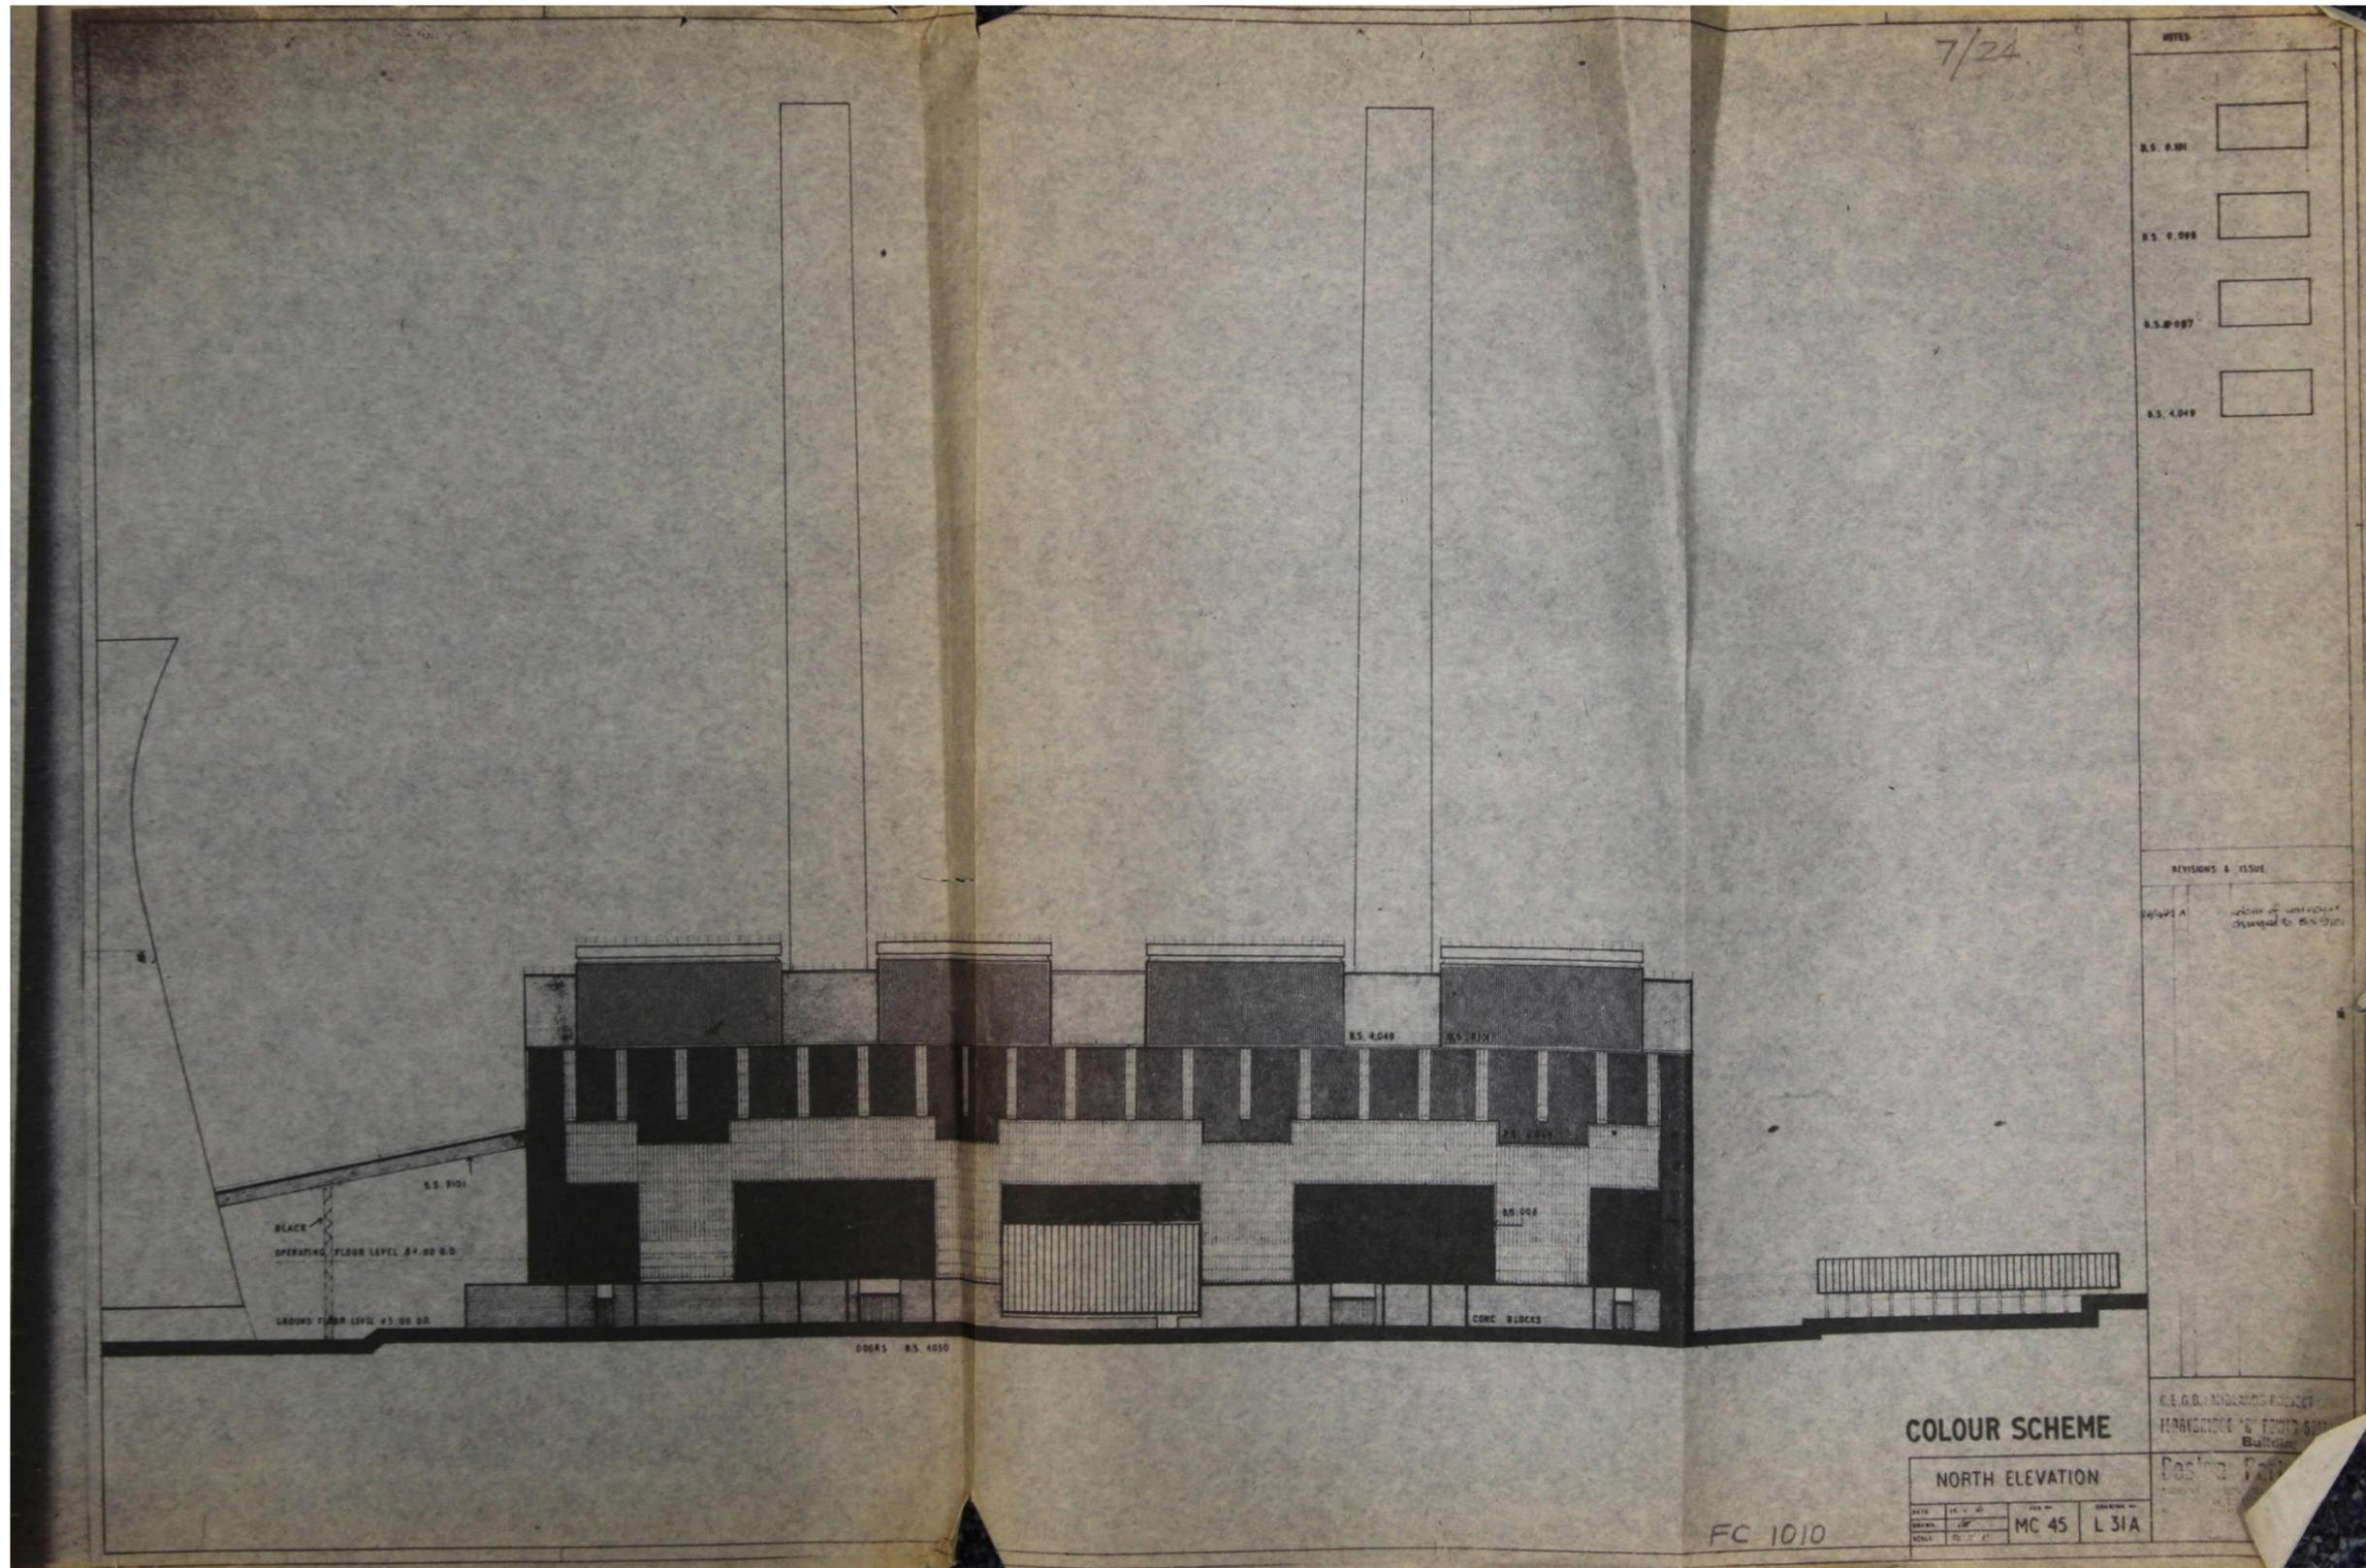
Outline Design Drawing of the north-west elevation of the station, showing the central control block, backed by the turbine hall, backed by the mill bay, backed by the boiler house and the station's chimneys (source SSE Generation Ltd private Archive 1961).
